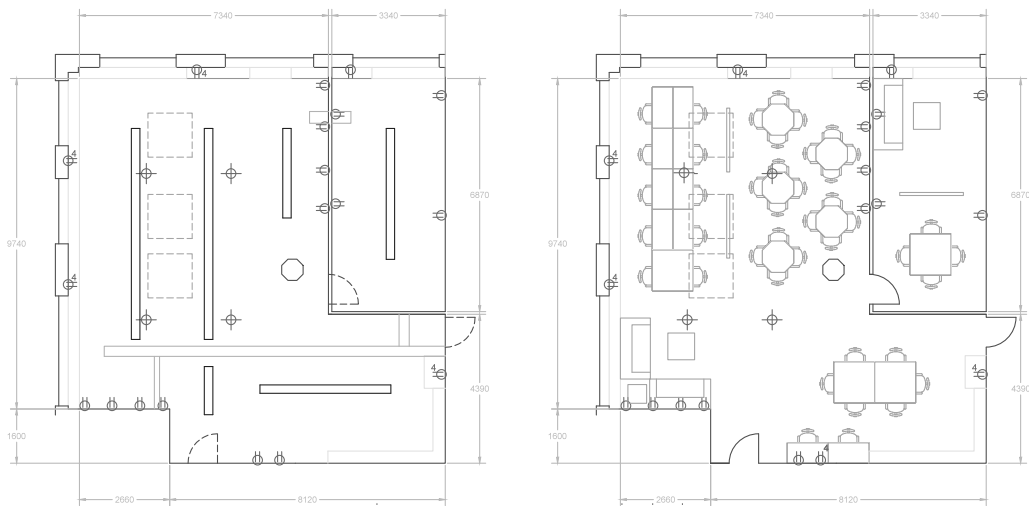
Ceiling and Floor plans of the redesigned student learning space.
